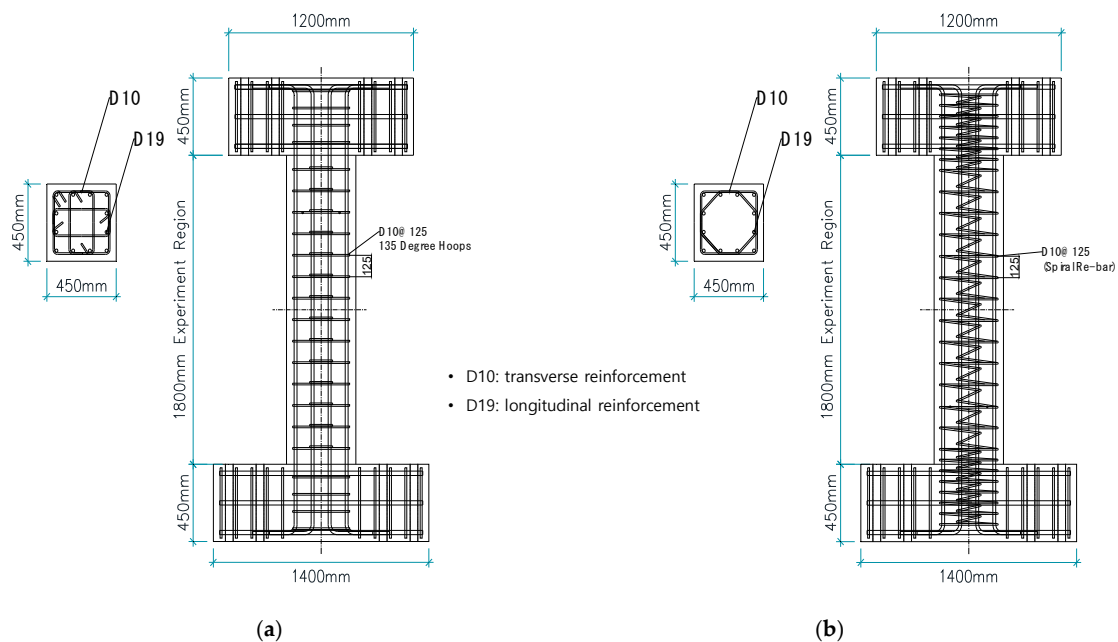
Details of specimens (Unit: mm): (a) H-F; (b) KSS.
